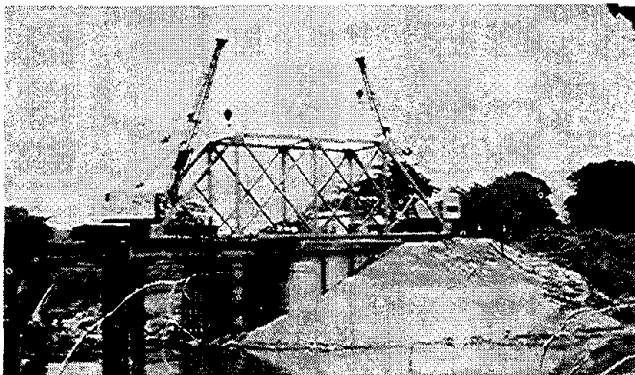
Installation of new trusses Cotaxtla River Bridge.
